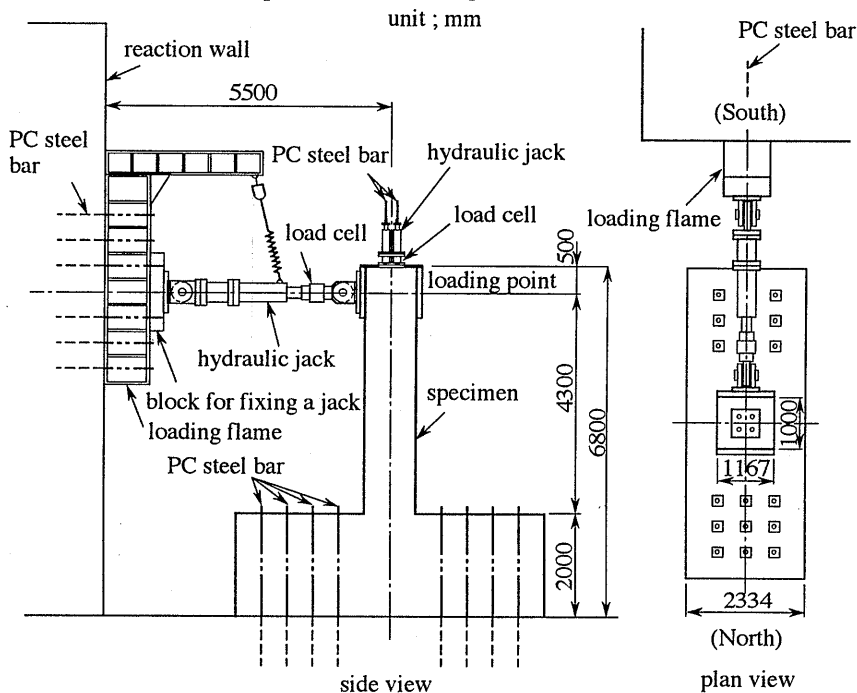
Dimensions of the specimen and loading method (Large size model)
